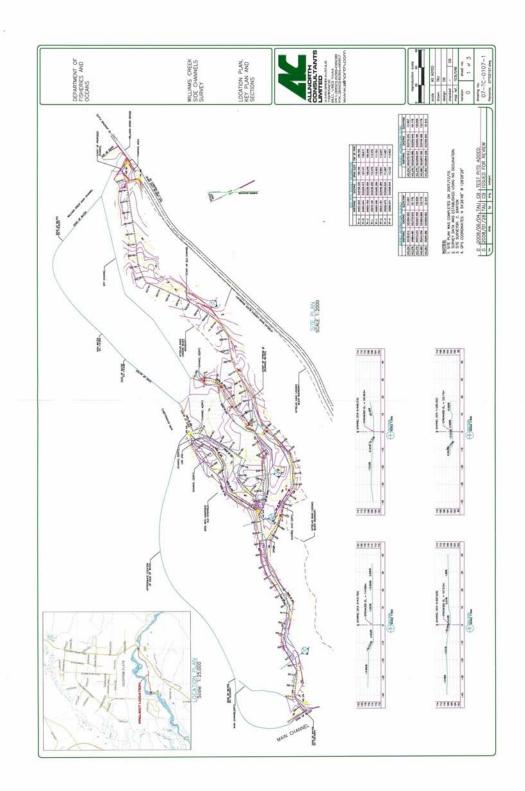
Williams Creek – survey of relic channels, test pit sites & propose surface water route.
